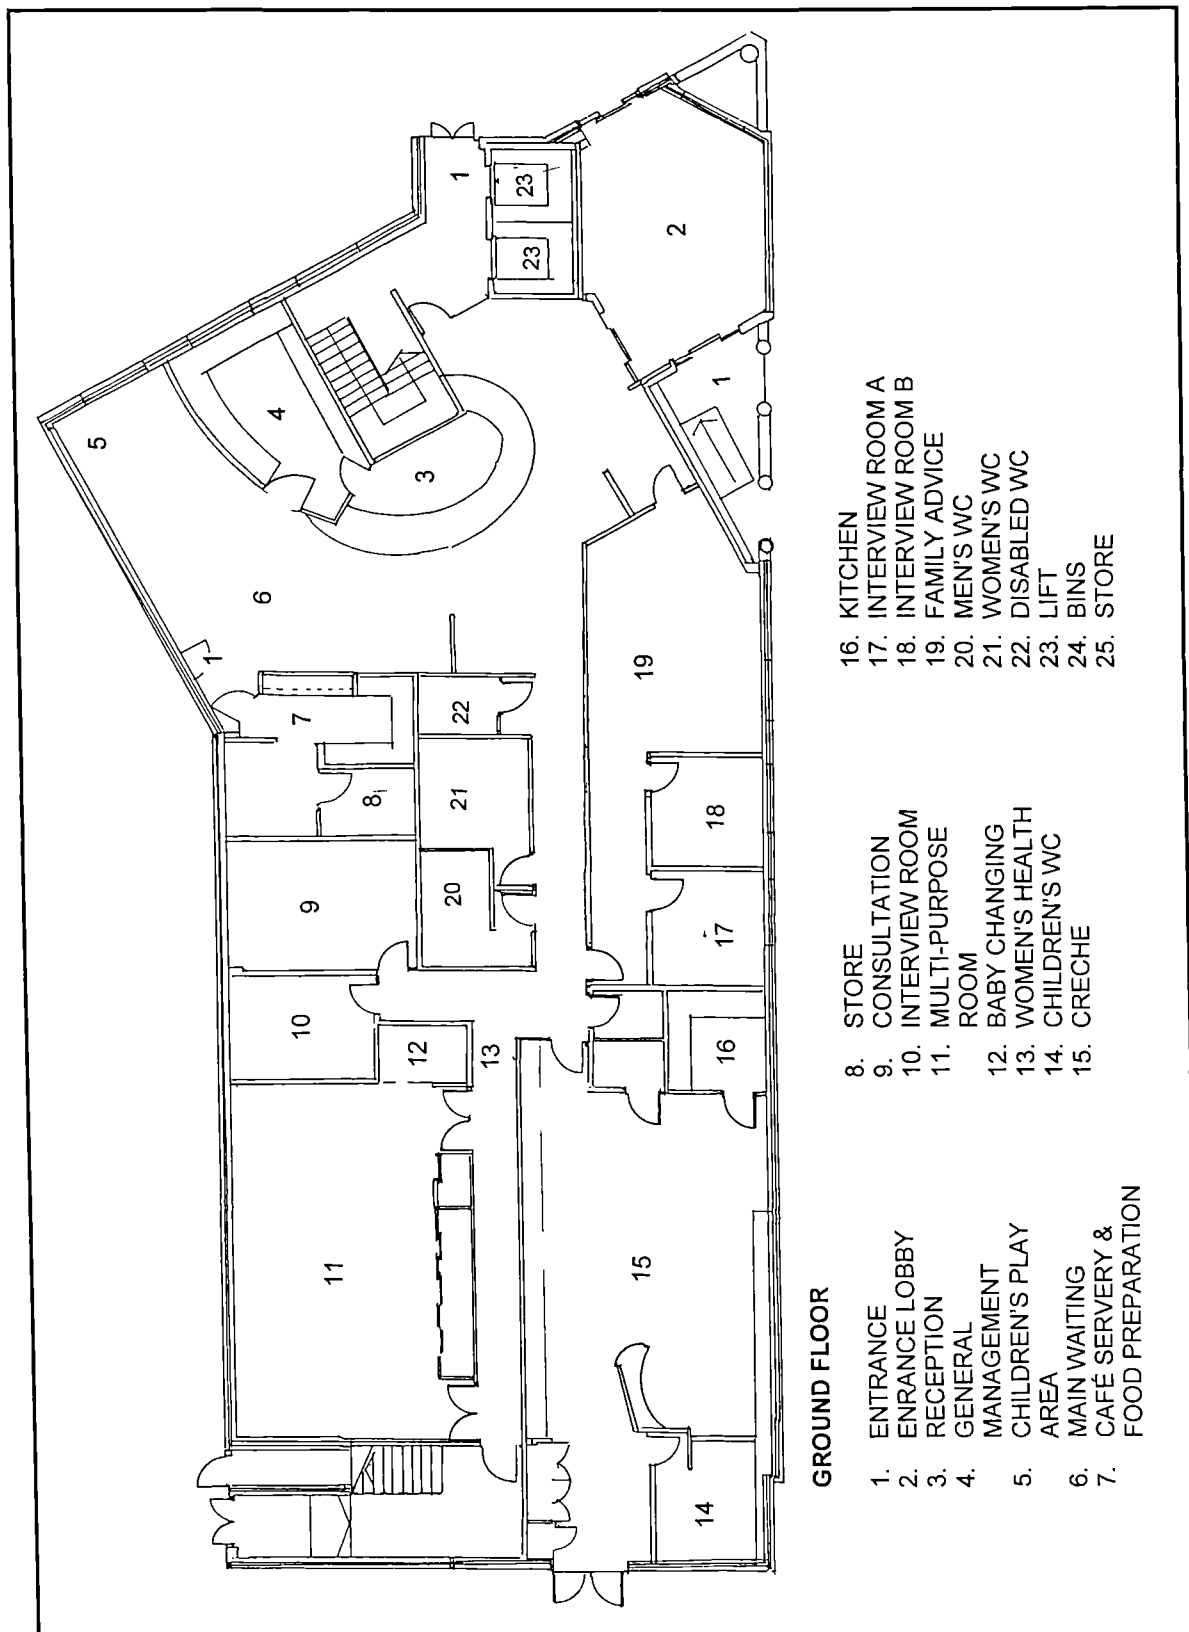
Kath Locke: Ground Floor Plan Architects: Snapes Design and Build
